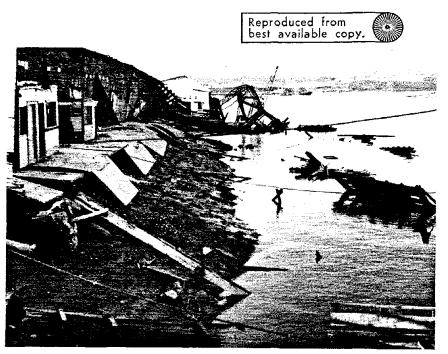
FAILURE OF GRAVITY WALL AT PUERTO MONTT - FROM (11)
